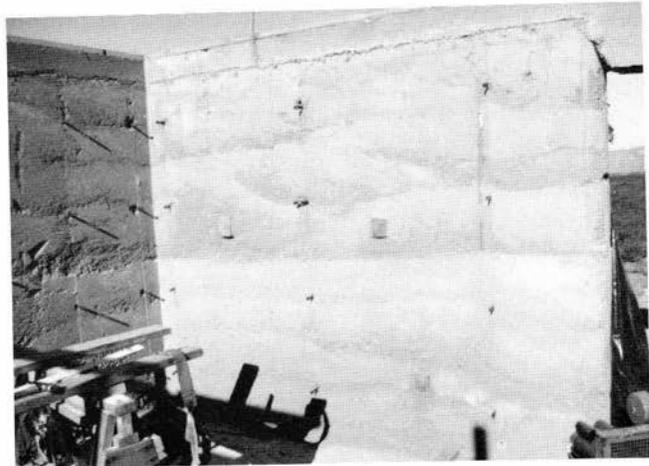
Exterior 2-ft-thick rammed-earth wall of home under construction. Note concrete bond beam topped by wooden frame. Soledad Canyon Earth Builders building site, Mesilla.
